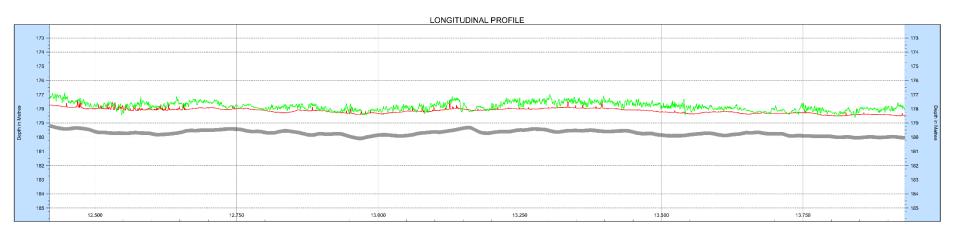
PL4556 As-built alignment sheet KP12.420 to KP13.930
